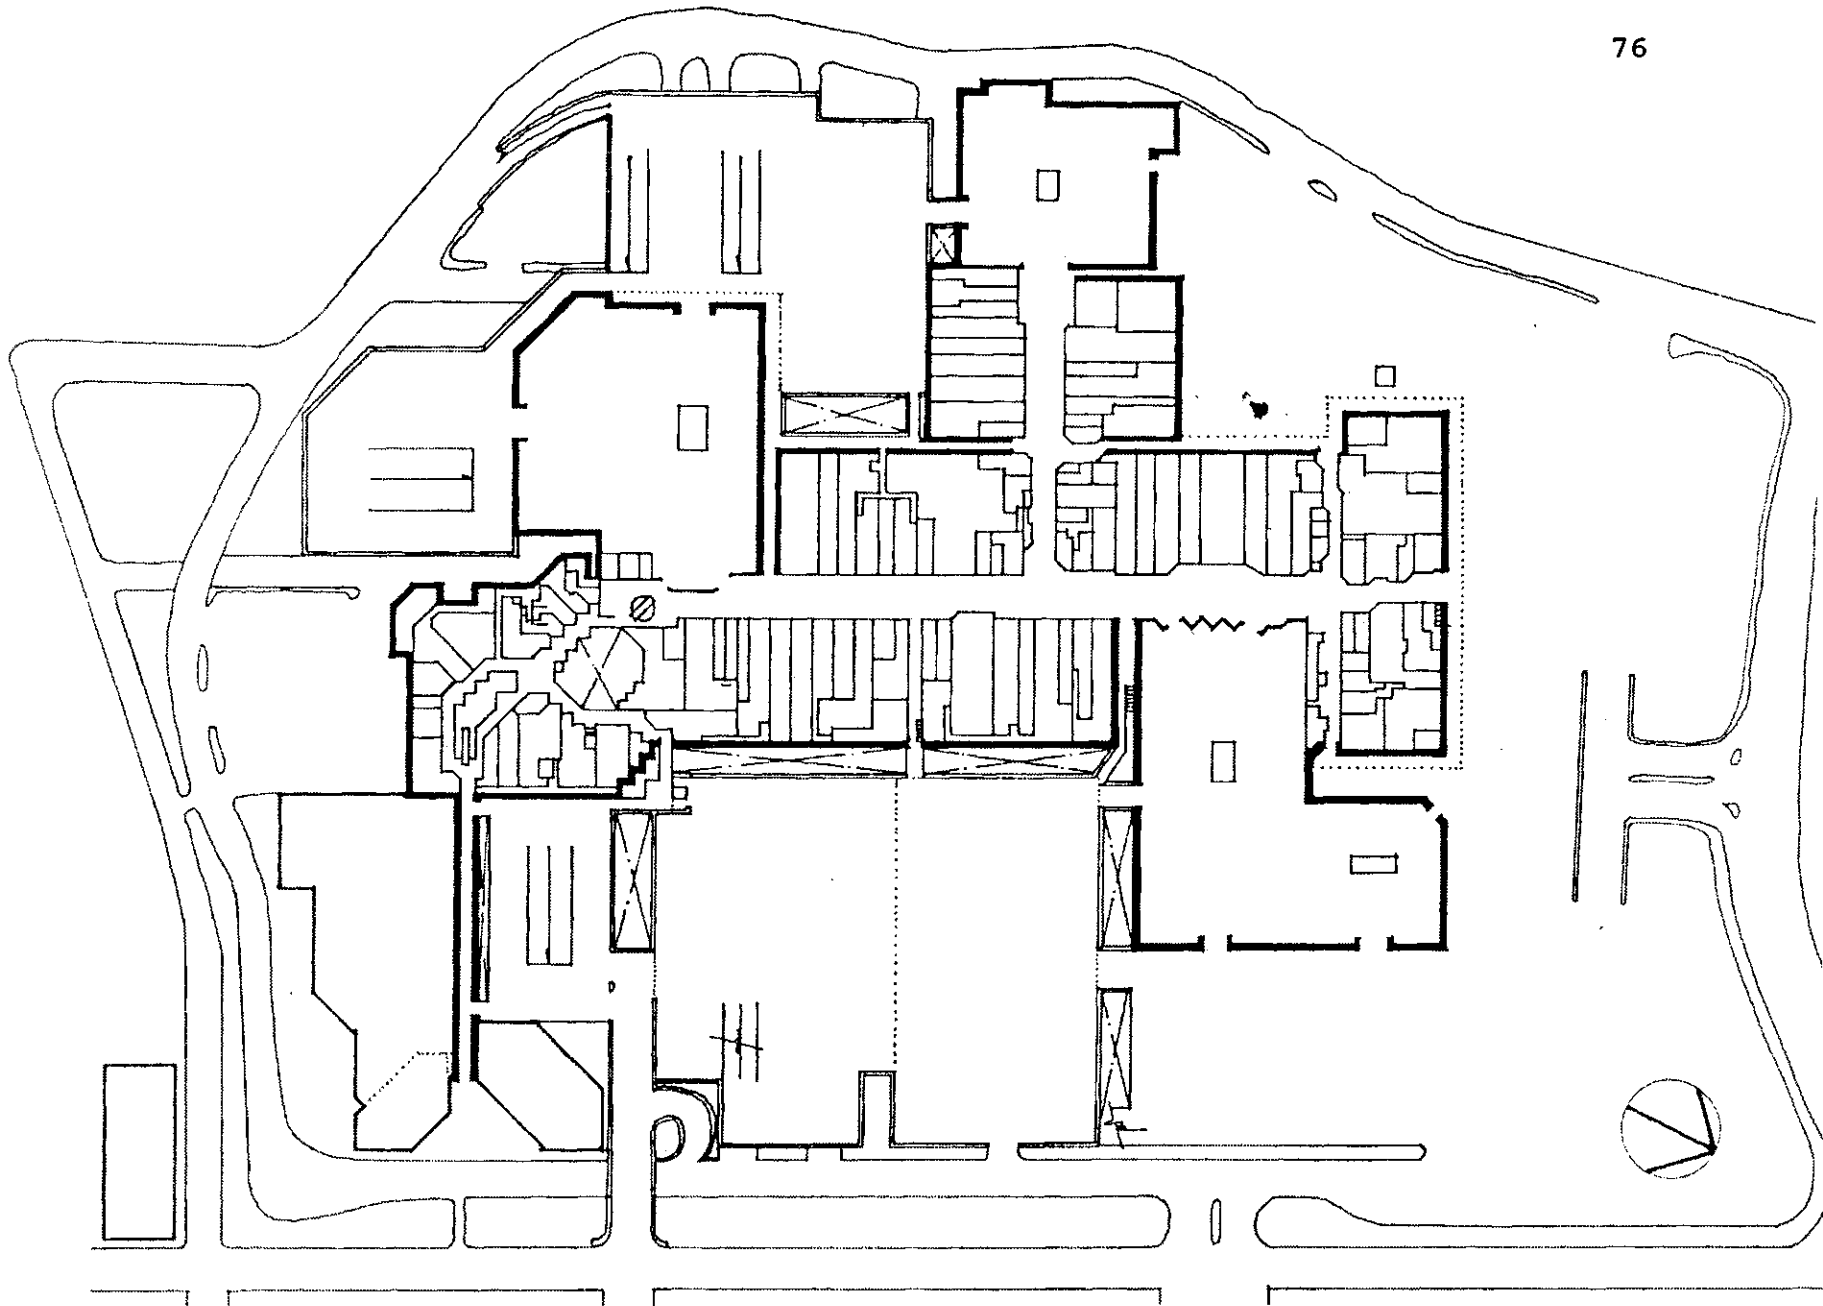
Lenox Mall-Site/Plan (plan courtesy of Sung Hong Kim)
